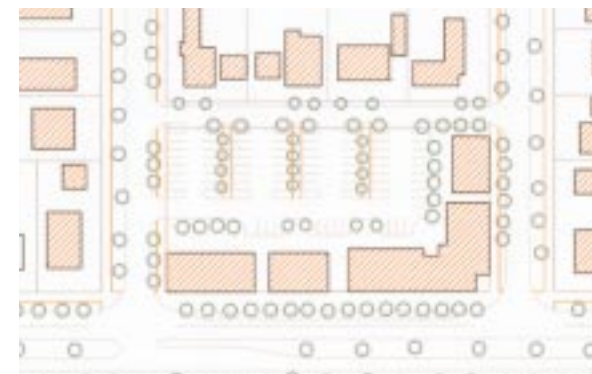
An example of a parking area designed for increased safety. Note the location of parking behind the commercial buildings, leaving the street frontage free for shoppers and pedestrians, and the fact that parked cars can be observed from people in the buildings. Dedicated pedestrian paths are designed to provide safe access.
